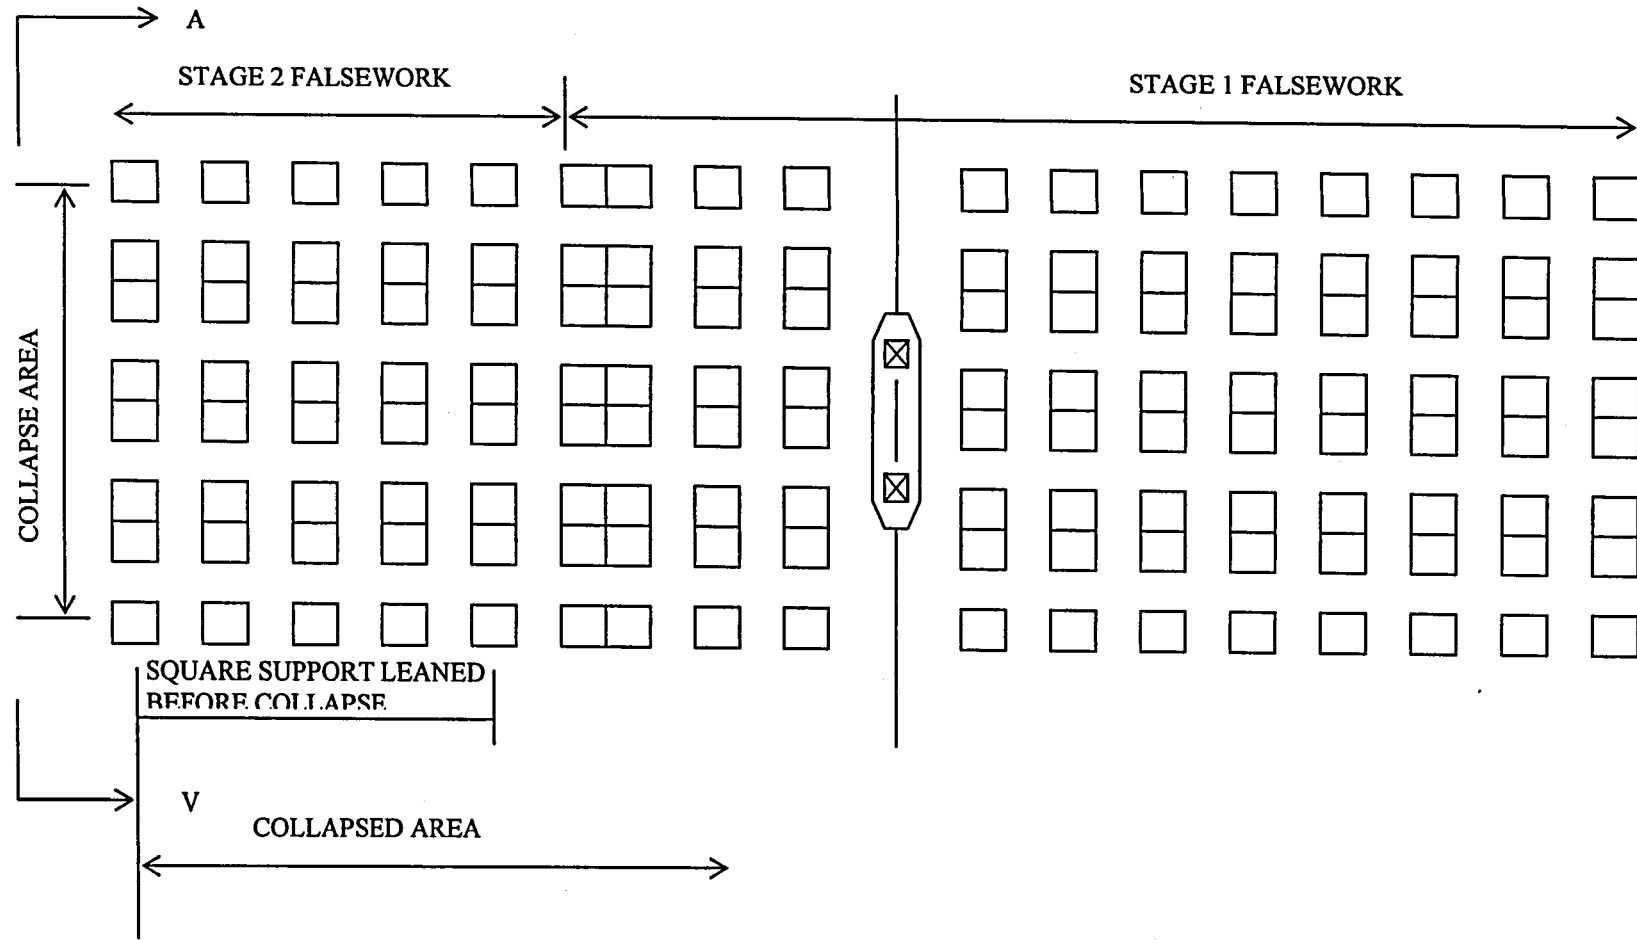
Layout plan of falsework supports, Tsing Yi, Hong Kong
